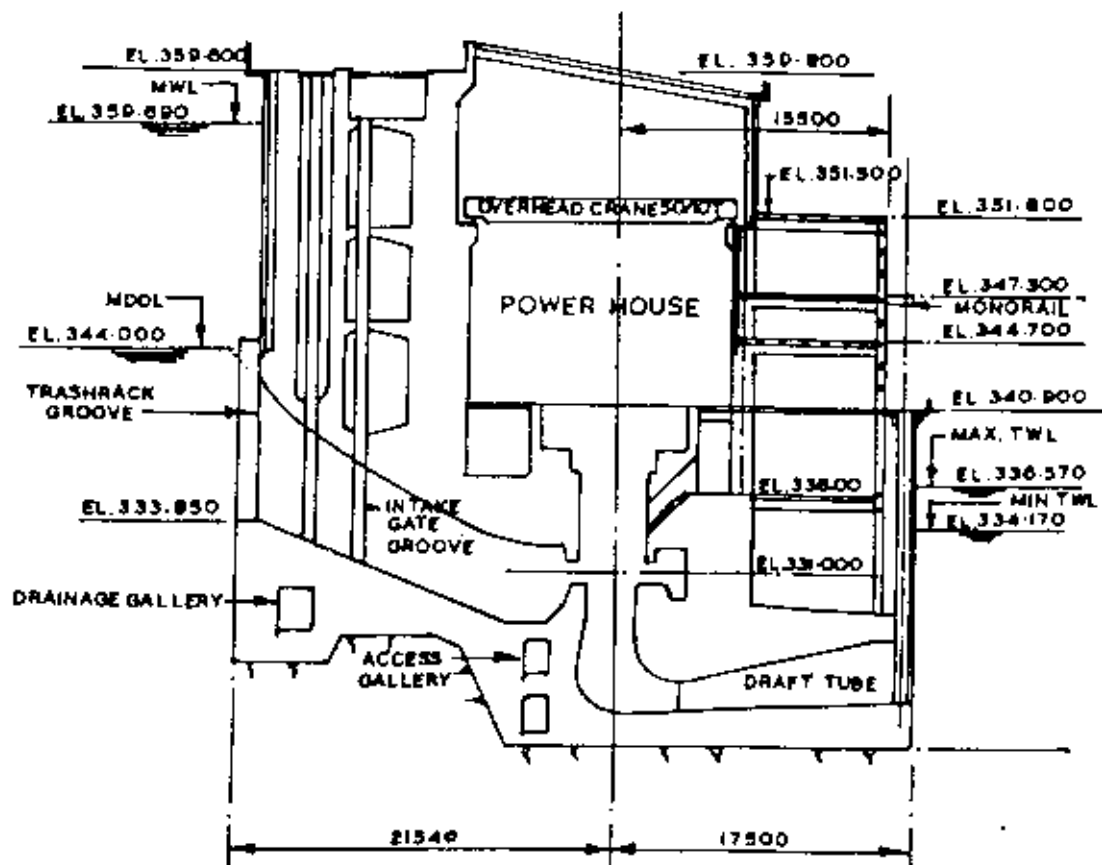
POWER HOUSE CROSS SECTION SMALL HYDRO ELECTRIC SCHEME
